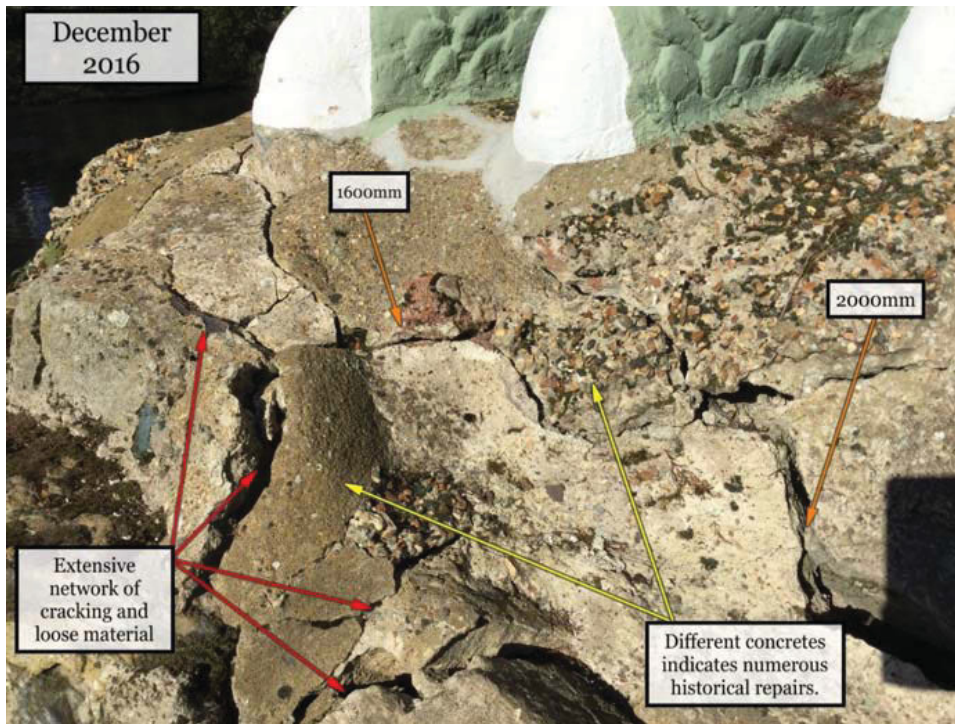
Photographed 15.12.16 – Complexity of crack network.
